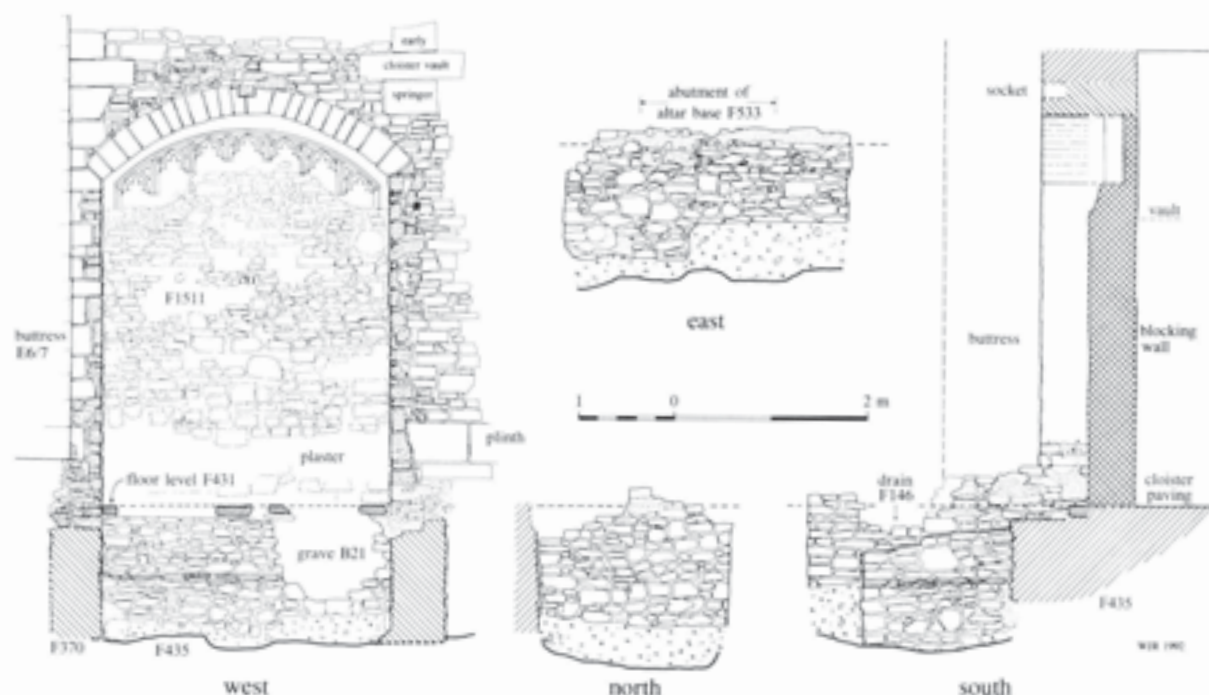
Internal elevations of the masonry of the Holy Cross chapel. Scale 1:80
